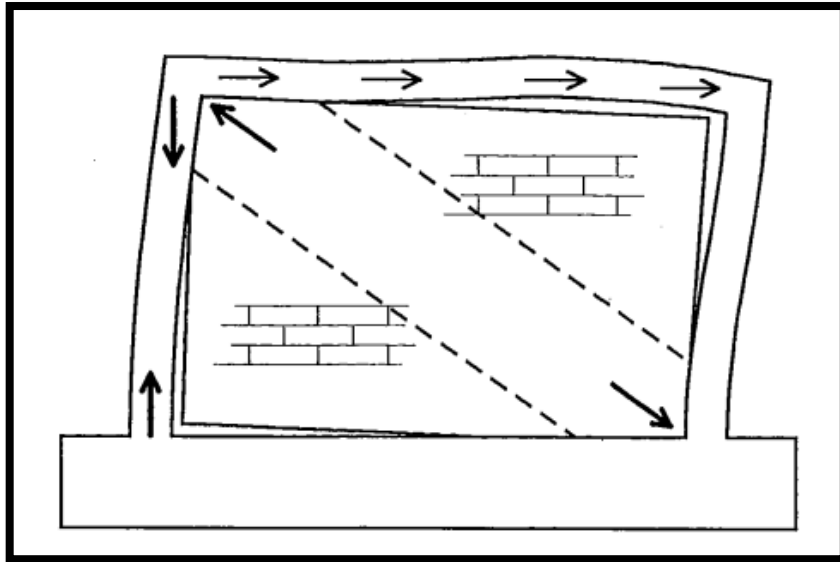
Equivalent truss mechanism for infilled frame structure (Crisafulli, 1997)
